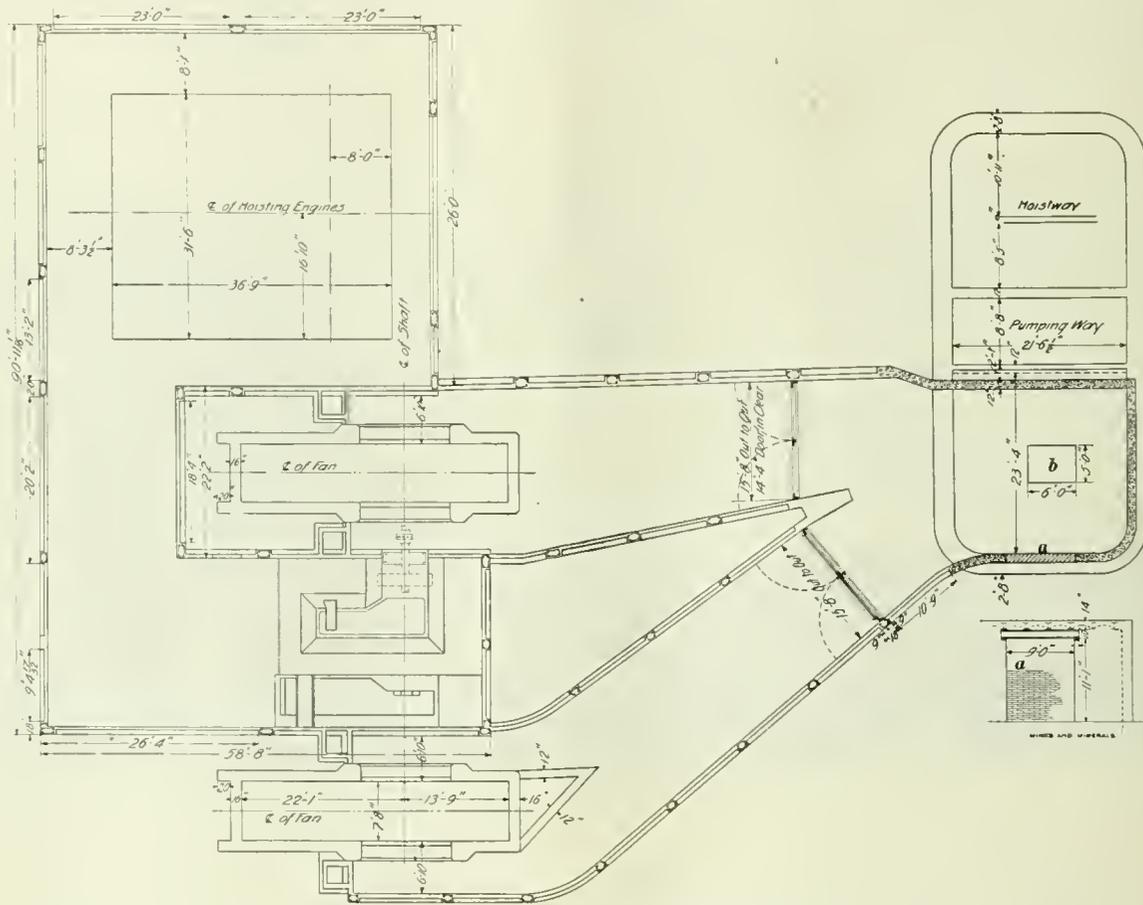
PLAN OF SHAFT AND SURFACE WORKS, WOODWARD NO. 3 SHAFT
